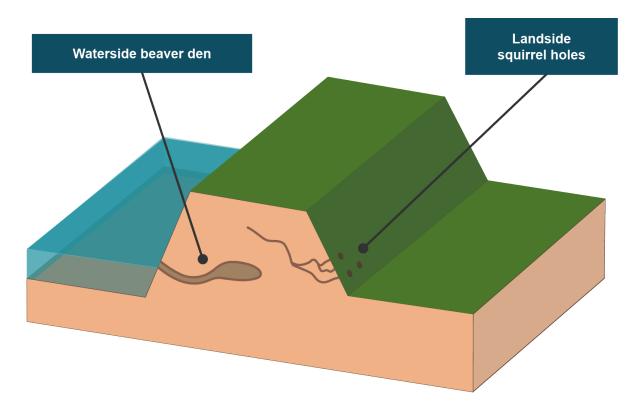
Burrowing Animal Tunnels Impacting a Levee
